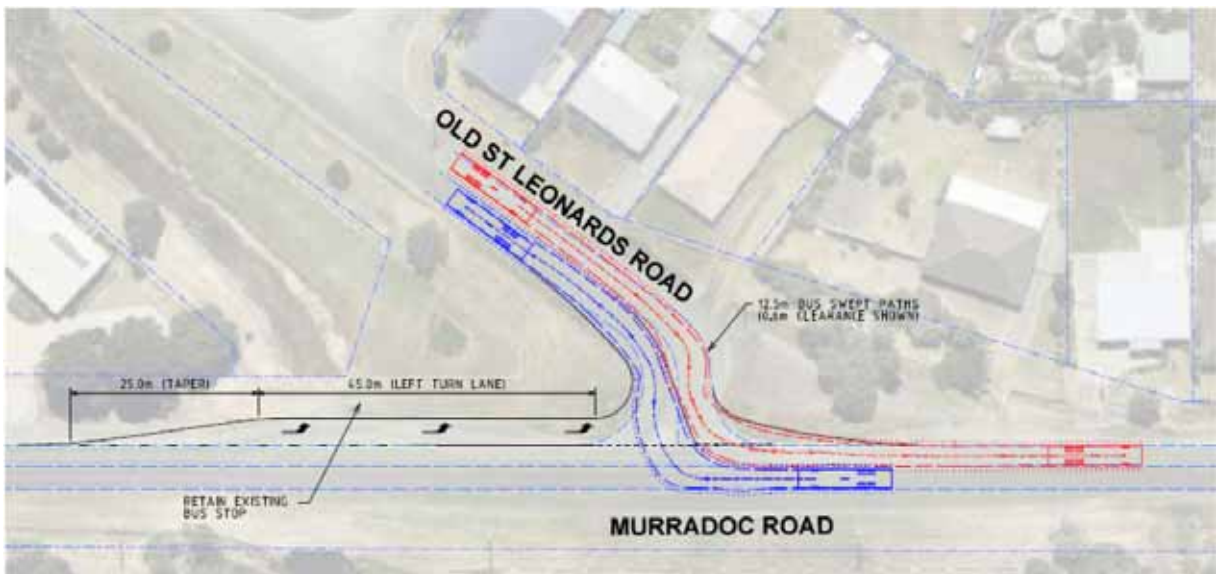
Murradoc Road/Old St Leonards Road intersection works
